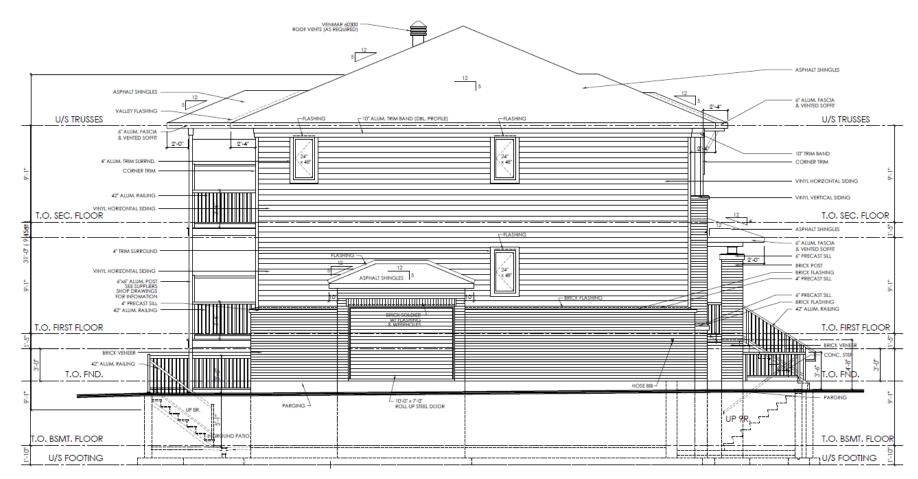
Proposed Building Elevation – Side (End Unit) Elevation (M. David Blakely Architects, dated May 2013)
